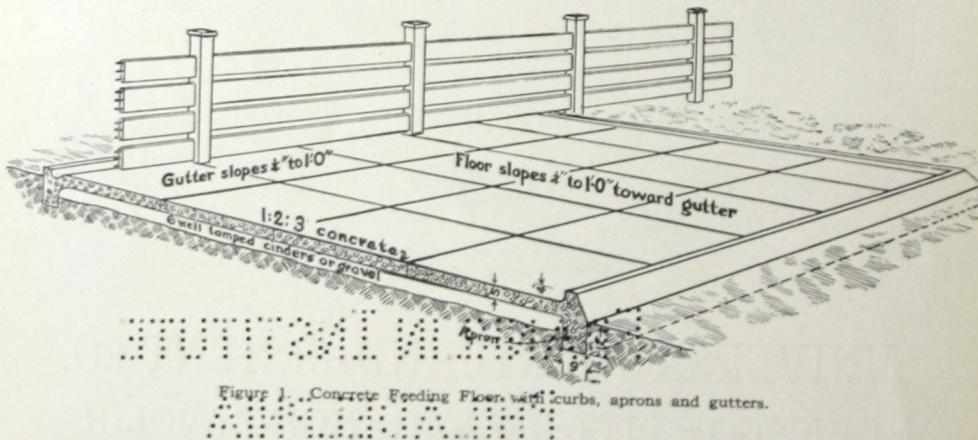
Concrete Feeding Floor, with curbs, aprons and gutters.
